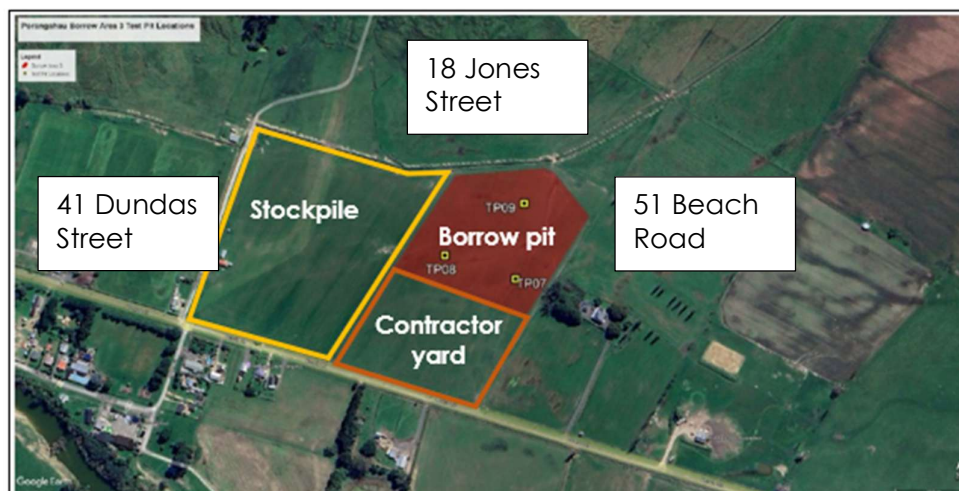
Adjoining Parties – Borrow pit and Stockpile site
